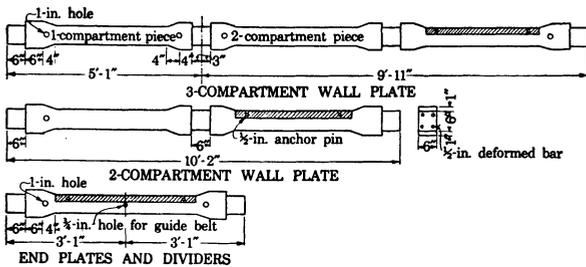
Precast cribbing used at Zaruma, Ecuador
